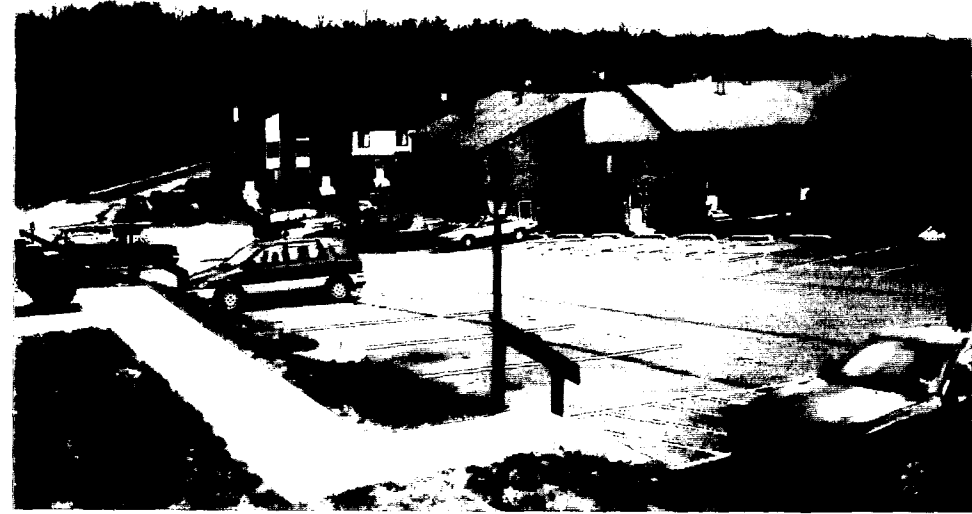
Townhouse buildings, cantilevered roofline, close proximity to each other (northeastern-southwestern exposures)
